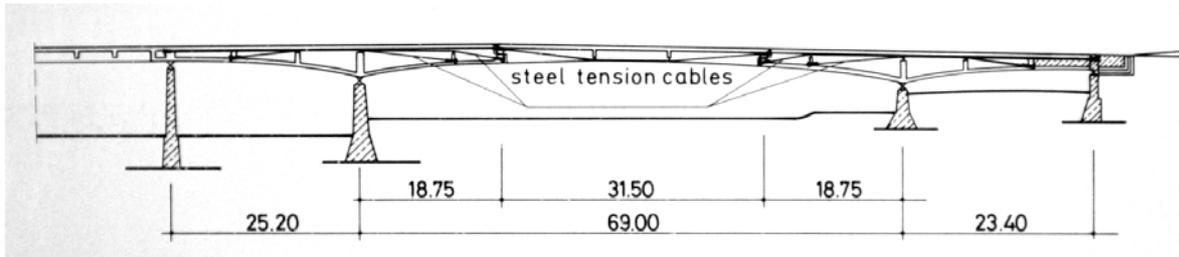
The Aue Bridge, the first prestressed beam bridge and the first with external prestressing in the world, Dischinger, 1936. Section showing arrangement of prestressing tendons. (Wittfoht)
